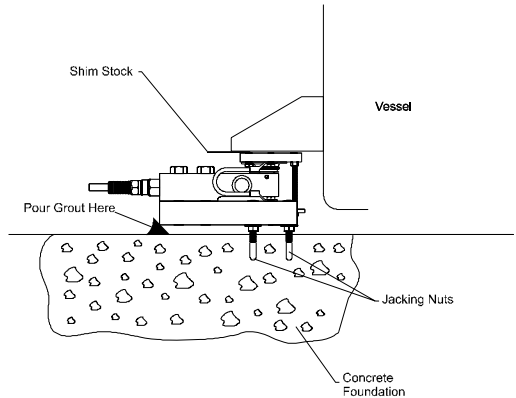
ADJUSTING FOR LEVEL WITH SHIM STOCK
